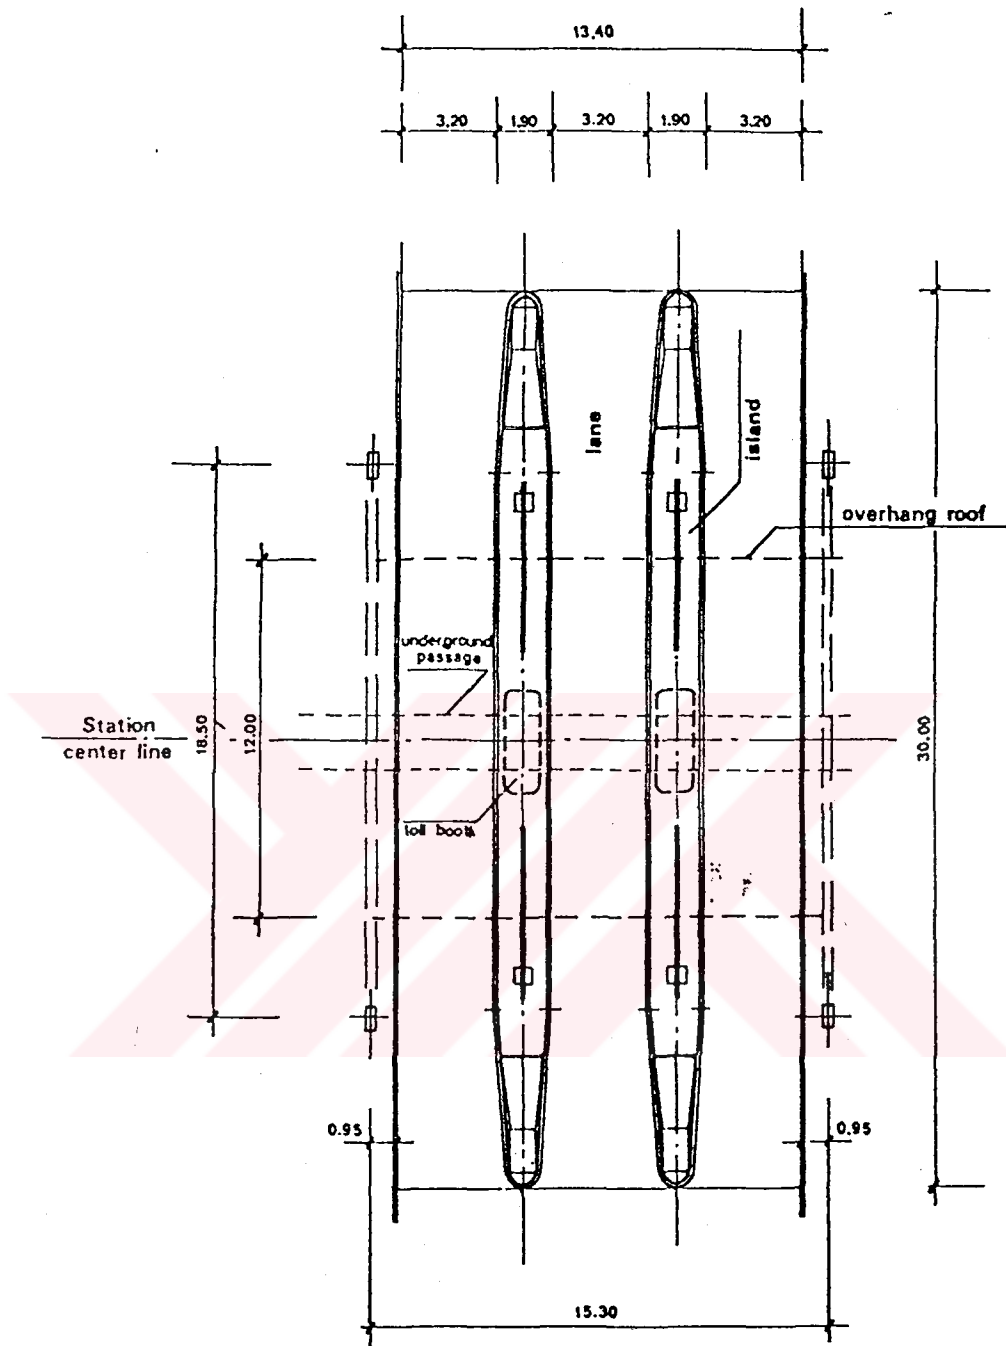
Cross Section and Elevation of Toll Lane (11)
